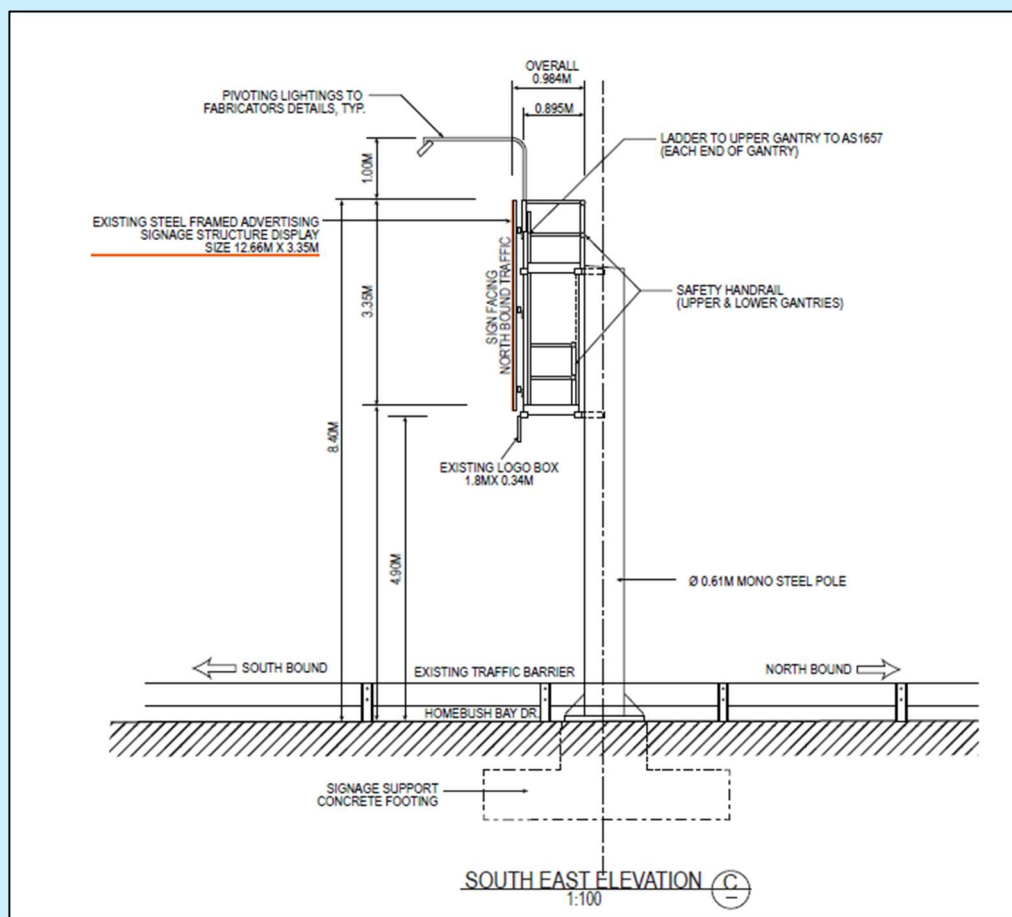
| cross section of the structures (source: revised architectural drawings 2024)
